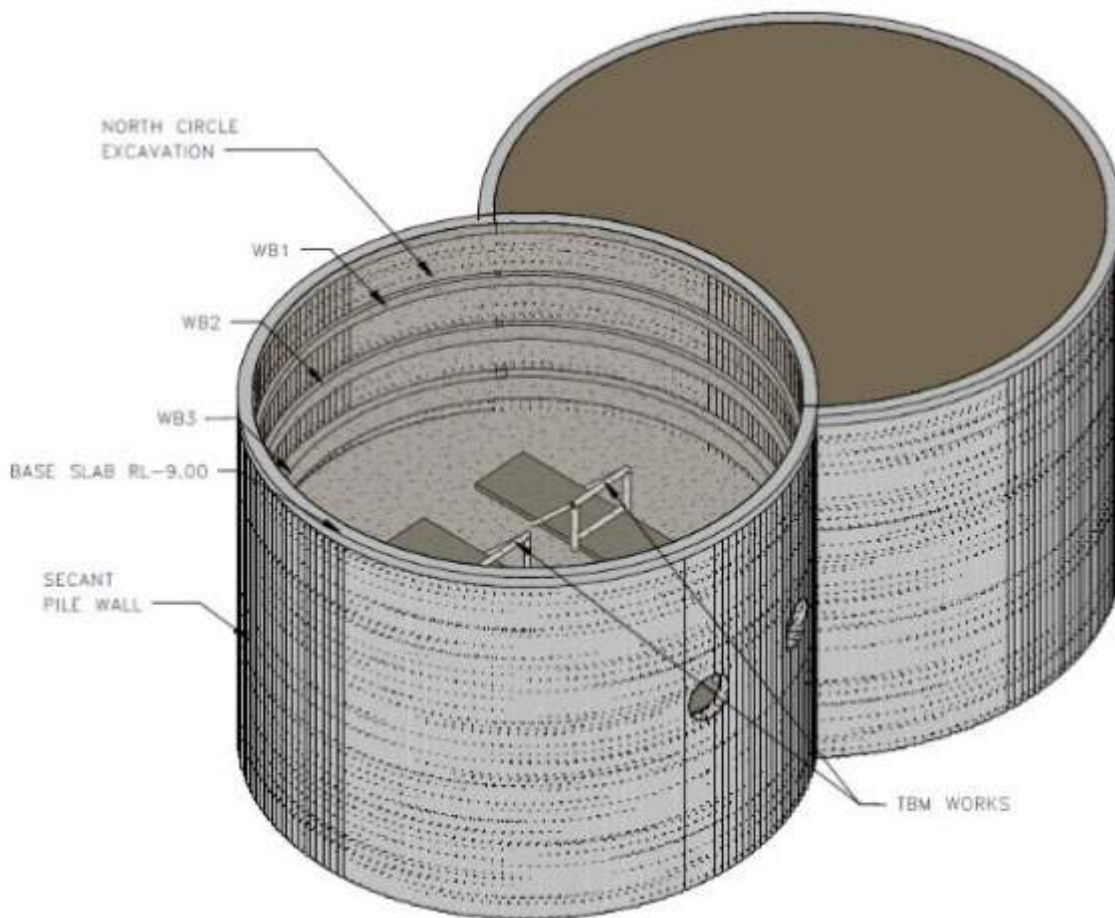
3D Model of the Temporary Works TBM Launch Shaft and Secant Piled Wall (Northern Water Partnership, 2023)
